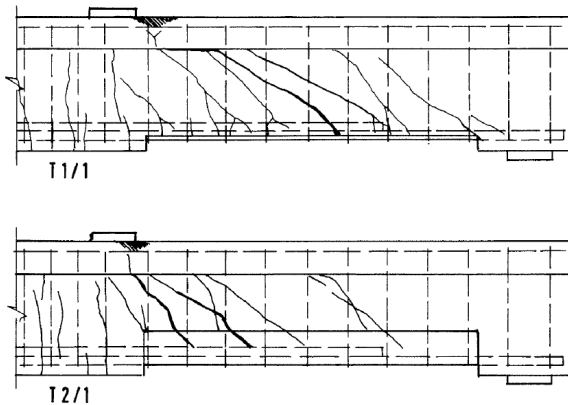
Crack patterns in tests T1/1 and T1/2.
